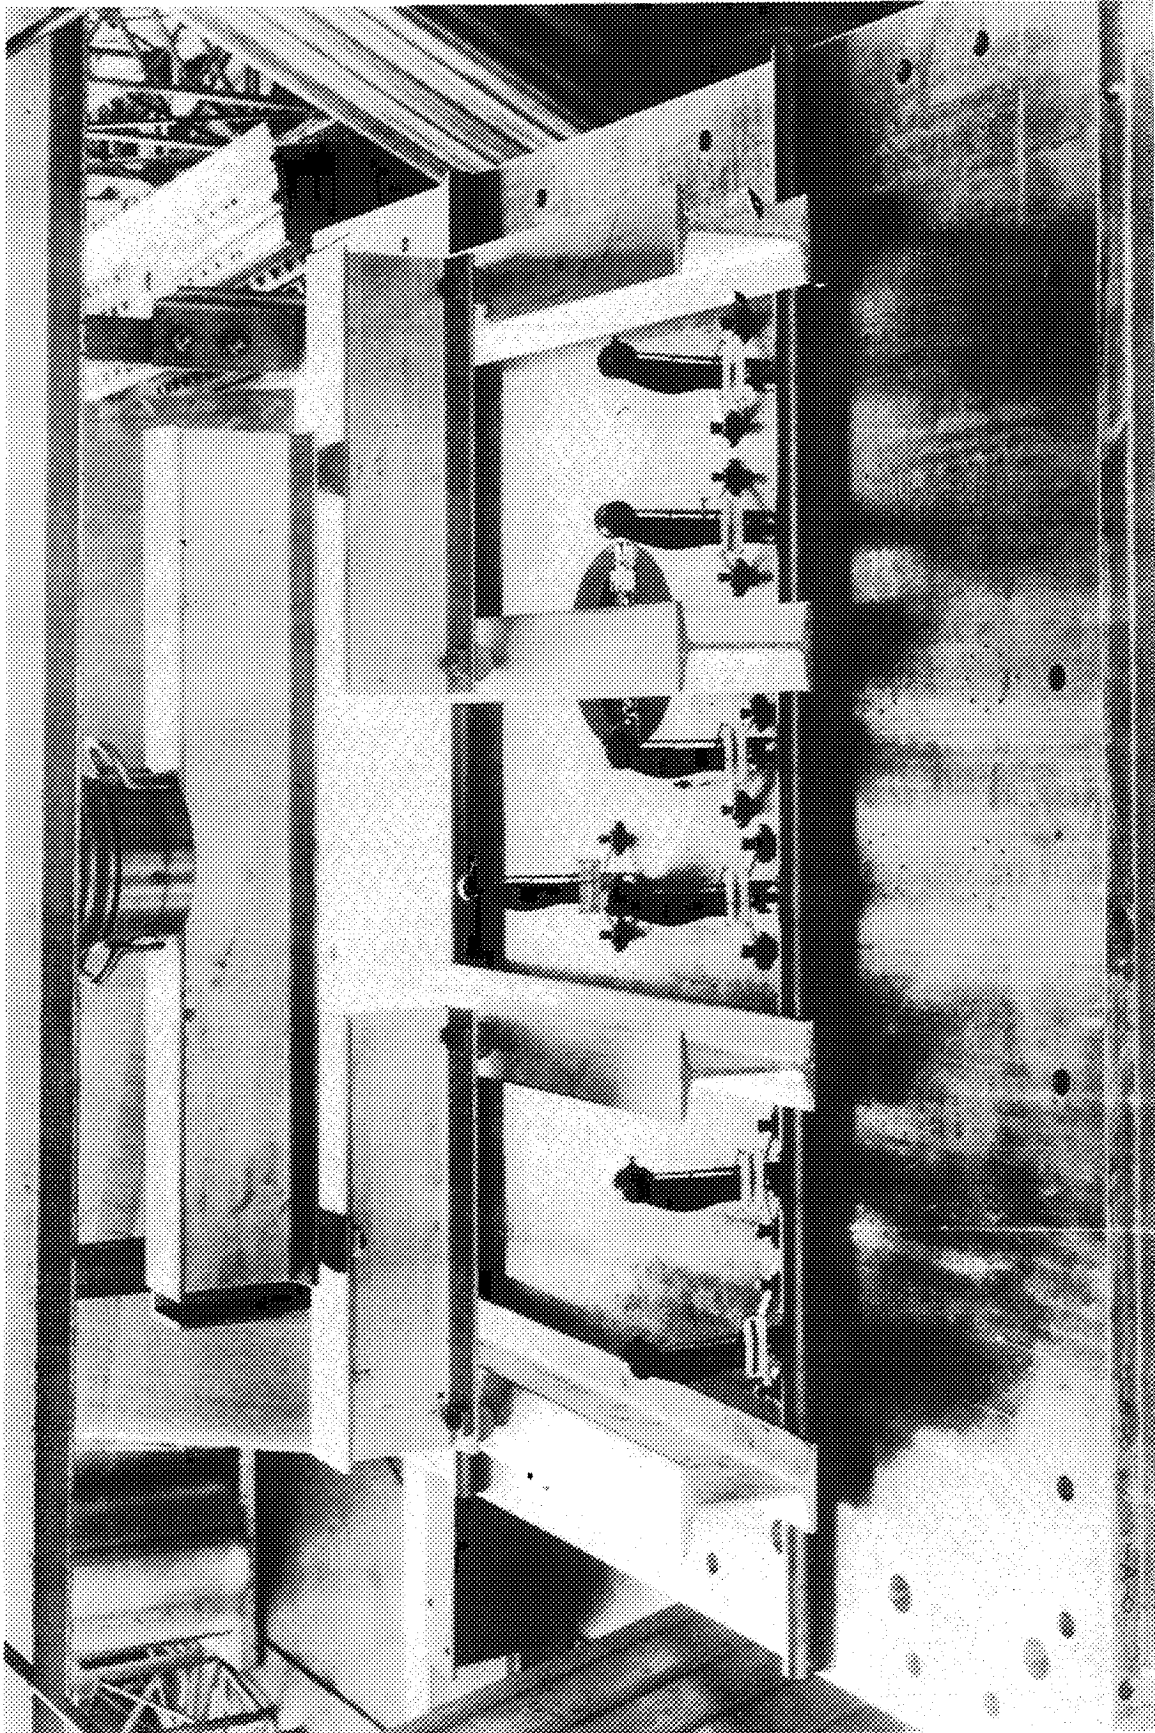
View of plate test showing Huggenberger tensiometer attached to top of plate and inside of hole.
